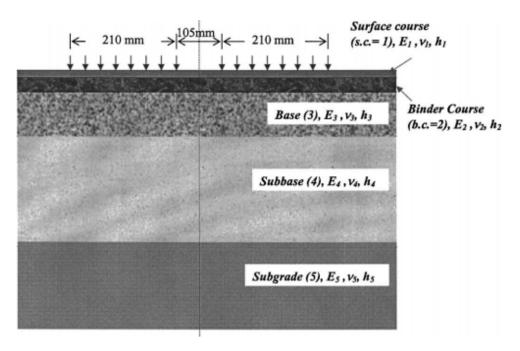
Layers of a Typical Flexible Pavement Design (Kruntcheva et al., 2005)
